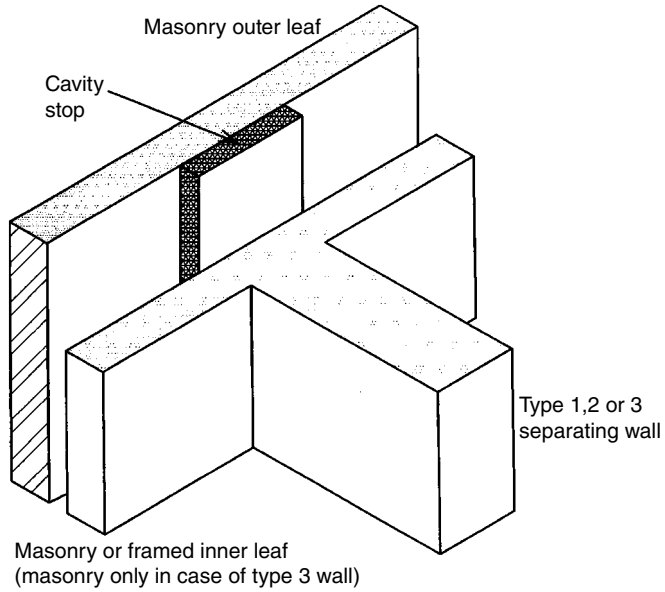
Provision of a flexible cavity stop at the junction of a Type 1, 2 or 3 separating wall and an external cavity wall.
